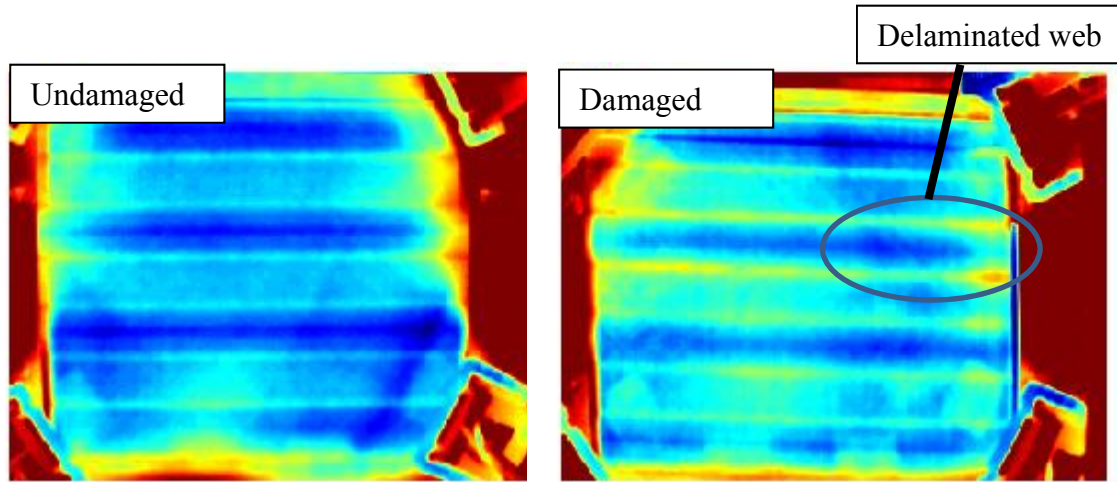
Comparison of damaged and undamaged Deck A specimens from full-scale load testing.
